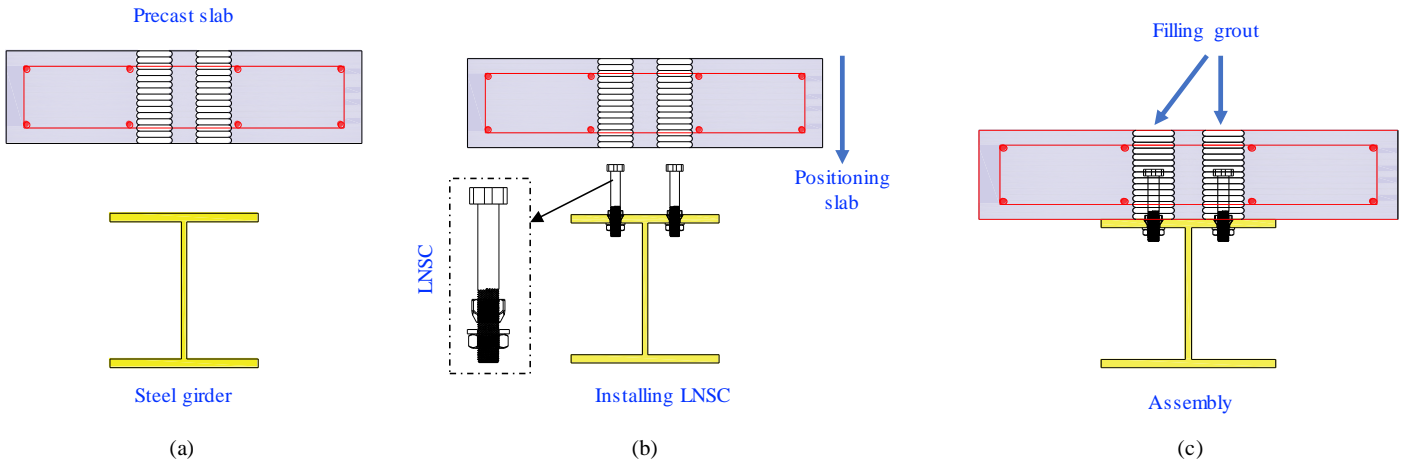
Assembly of steel-precast concrete composite beam using LNSC
